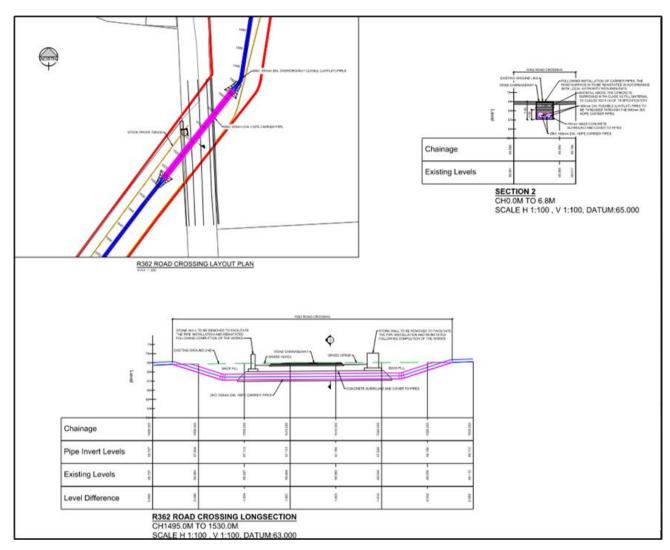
Proposed R362 road crossing detail. Source Dwg. 24821-MWP-00-00-DR-C-0401 (MWP) | not to scale
